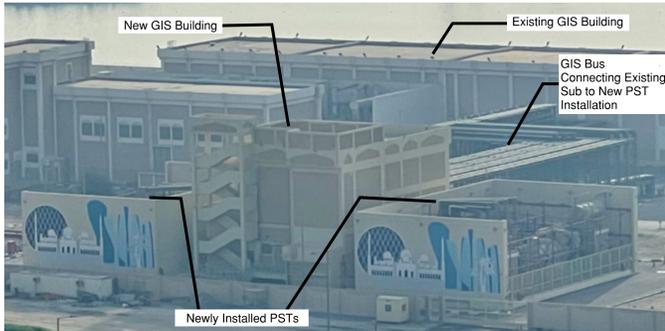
Substation A overview showing the newly installed parallel PST system.
